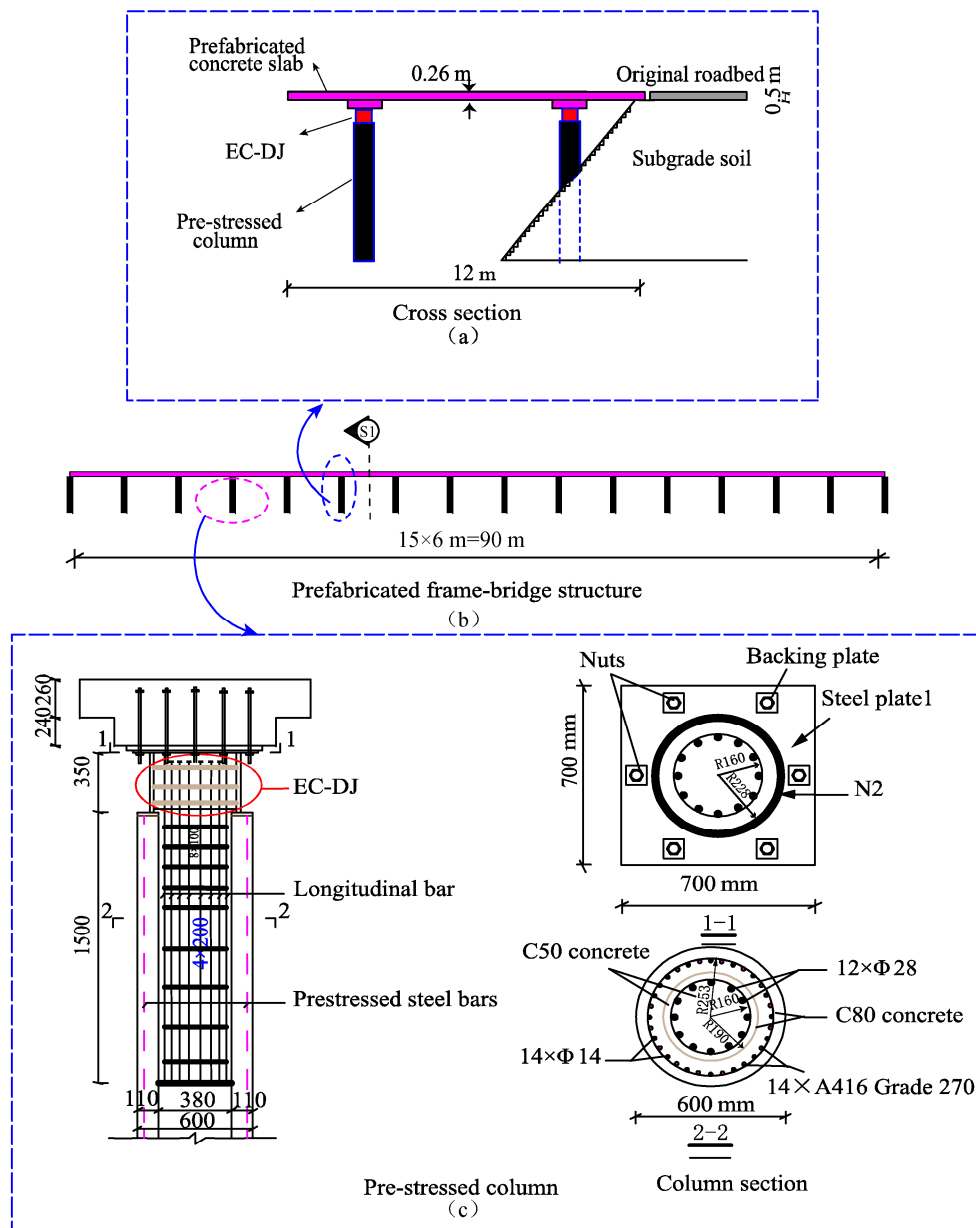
The configuration of the prefabricated frame bridge. (a) Cross section. (b) Pre-fabricated frame bridge structure. (c) Pre-stressed column.
